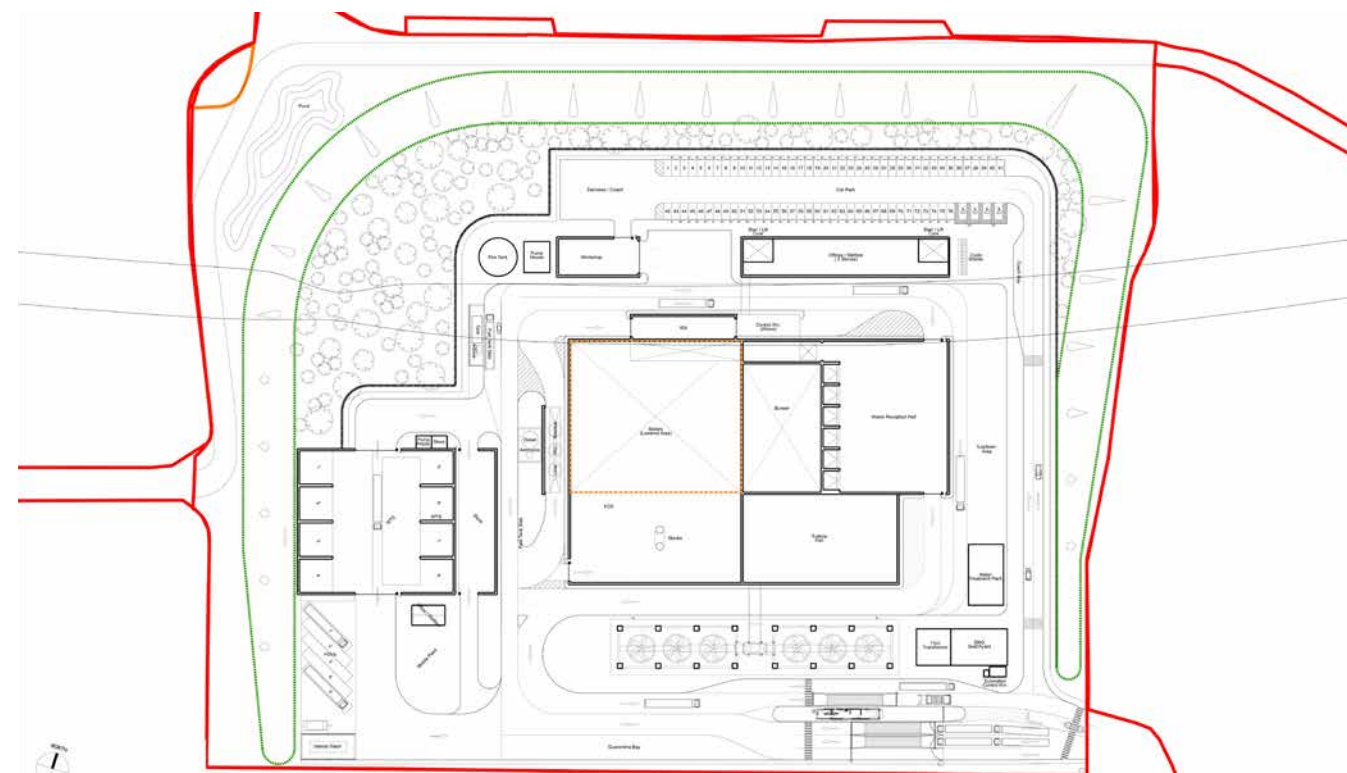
Initial site layout study – U-shaped arrangement of the ERF
